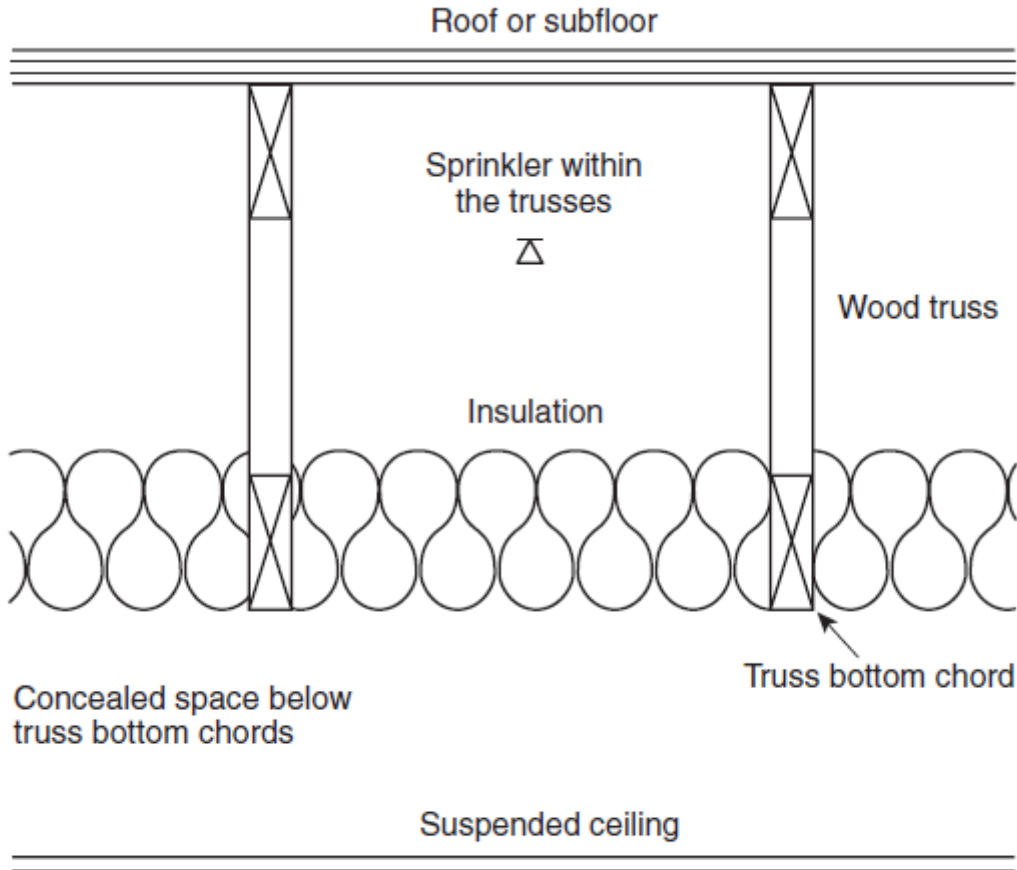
One Acceptable Arrangement of Concealed Space in Truss Construction Not Requiring Sprinklers.
